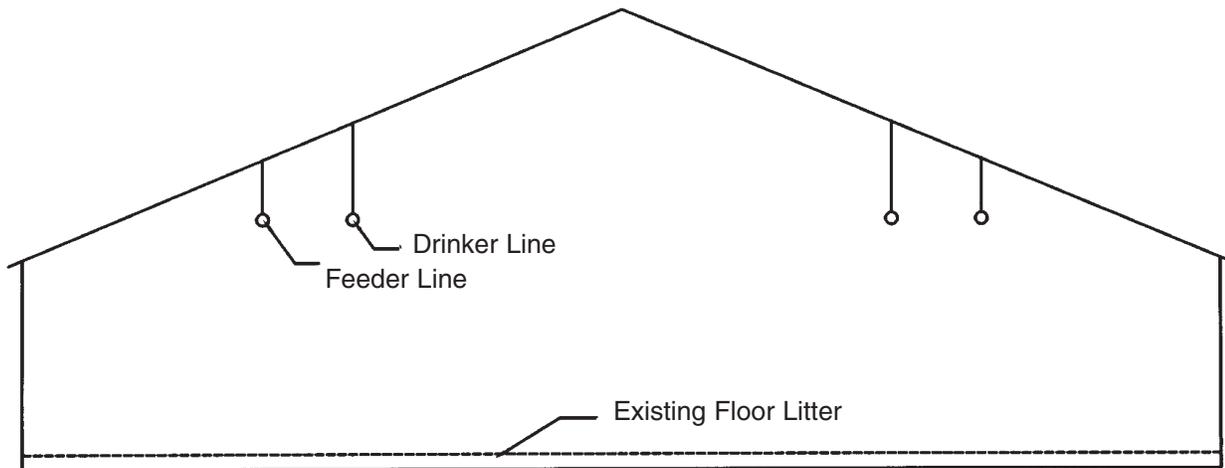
Cross-section of broiler house with feeder and drinker lines raised to ceiling.
